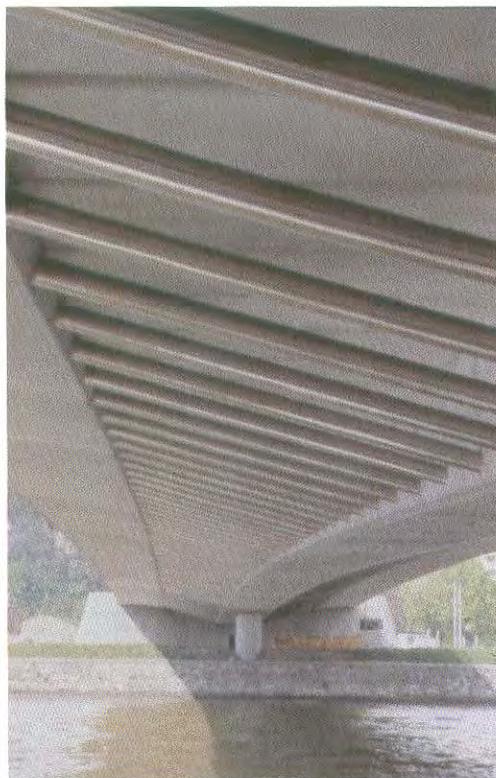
Stainless steel struts for the “Val-Benoit” Bridge – Liège, Belgium [2]
